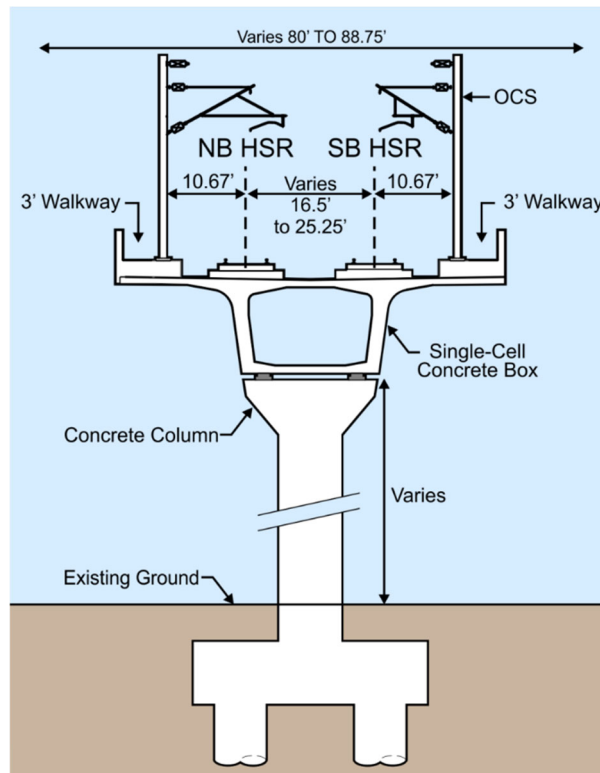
Elevated Single-Structure Typical Cross Sections
